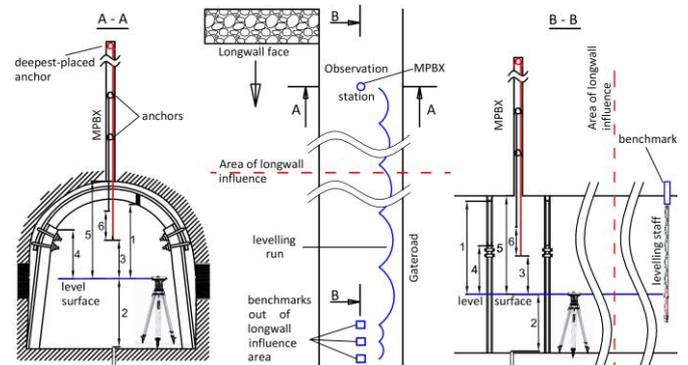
Levelling of "support-rock mass" system elements and anchors of extensometer: 1–5 readings from staff placed on: 1 – top section of steel arch; 2 – gateroad floor; 3 – the deepest placed anchor of the extensometer; 4 – end of steel arch rack; 5 – collar of the borehole of extensometer; 6 – displacements of the anchors of extensometer with respect to the deepest (highest) placed anchor
